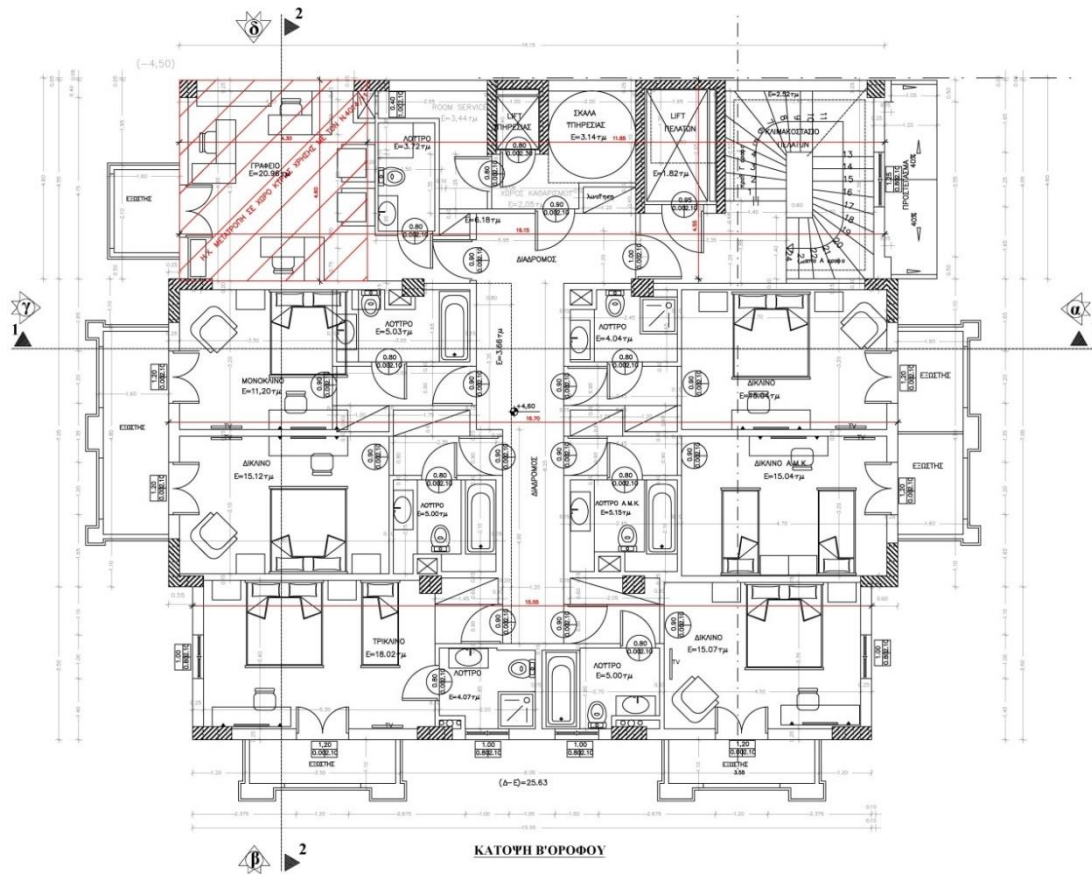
Plan view of the typical floor of the hotel (Spyropoulos, 2012)
